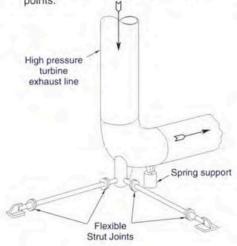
Spring support and restraint for a 30" (750mm) exhaust pipe from a high-pressure turbine. Two Flexible Strut Joints permit vertical expansion movement of the exhaust pipe, but prevent any horizontal movement of the vertical section pipe.
